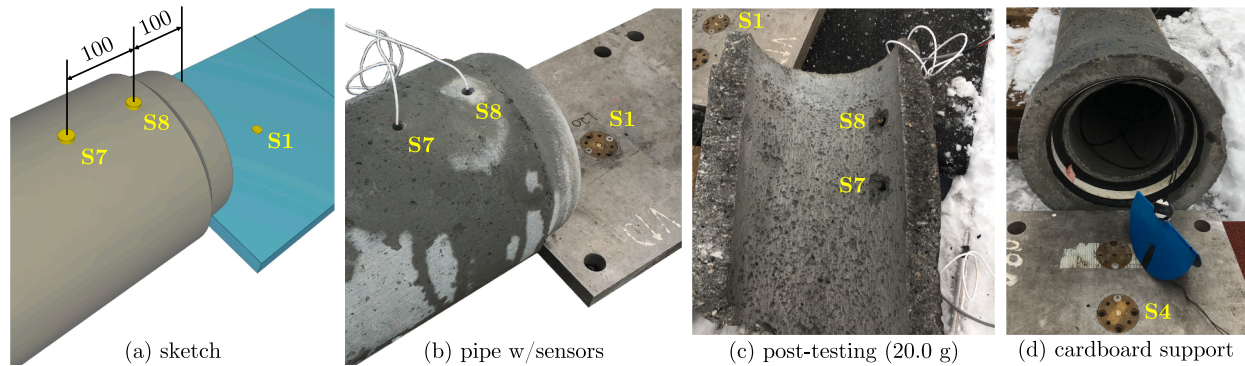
Position of pressure sensors 1, 7 and 8 shown as (a) sketch, (b) mounted in the pipe before testing, and (c) after testing pipe P200-XVII (20.0 g C-4), while (d) shows the cardboard support for the charge.
